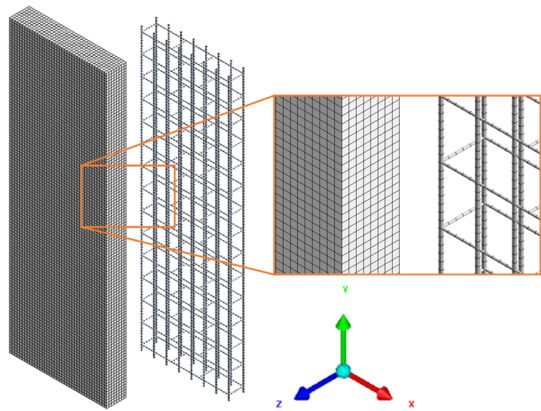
Numerical model of RC-wall with discrete reinforcement.
